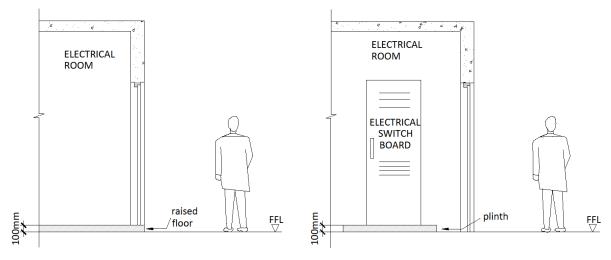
Raised electrical room (left) and switchboard plinth (right)
